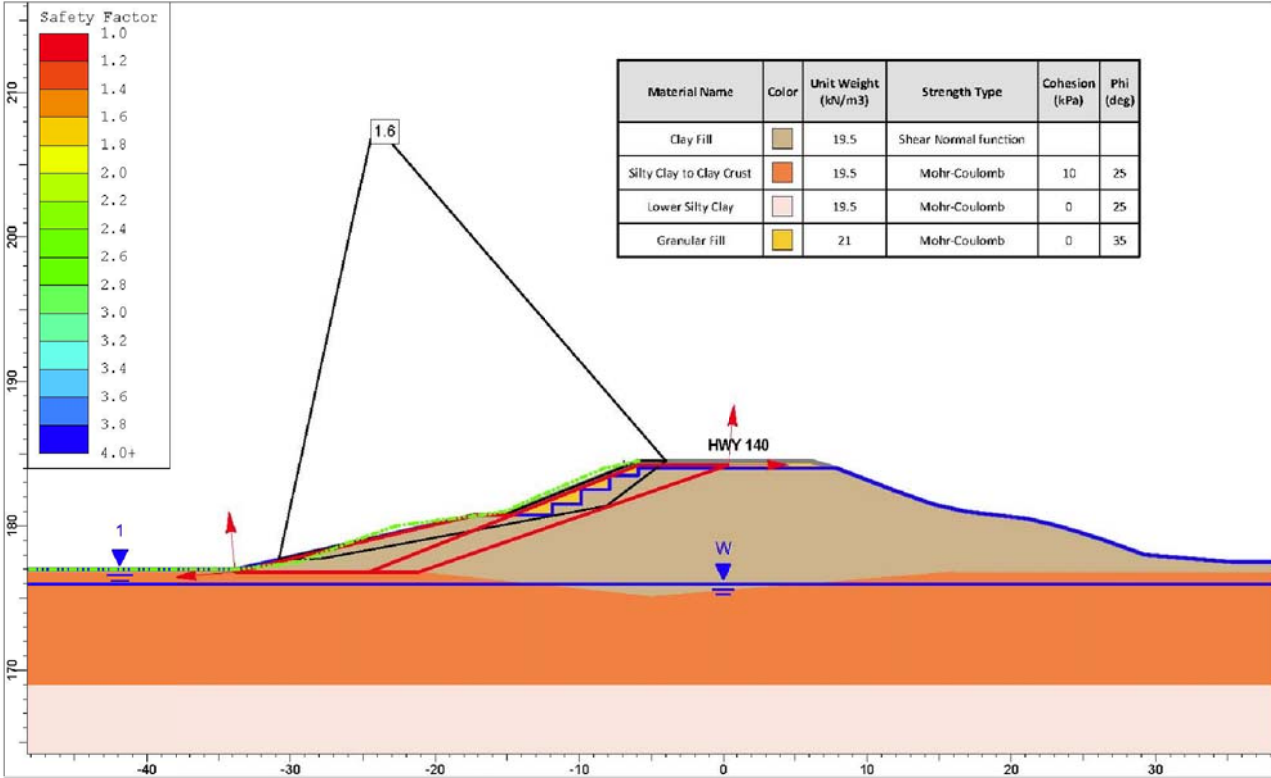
PLATE PILE SLOPE STABILIZATION (OPTION 4)
